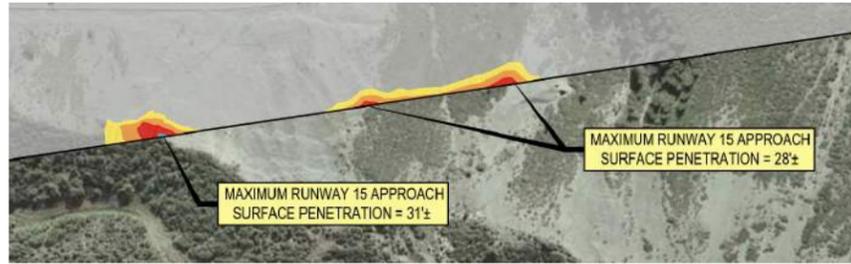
Approach Surface Penetrations - 30' Runway Shift - Near Runway Threshold (Appendix B, Alternative 5, Sheet 4 of 4)
